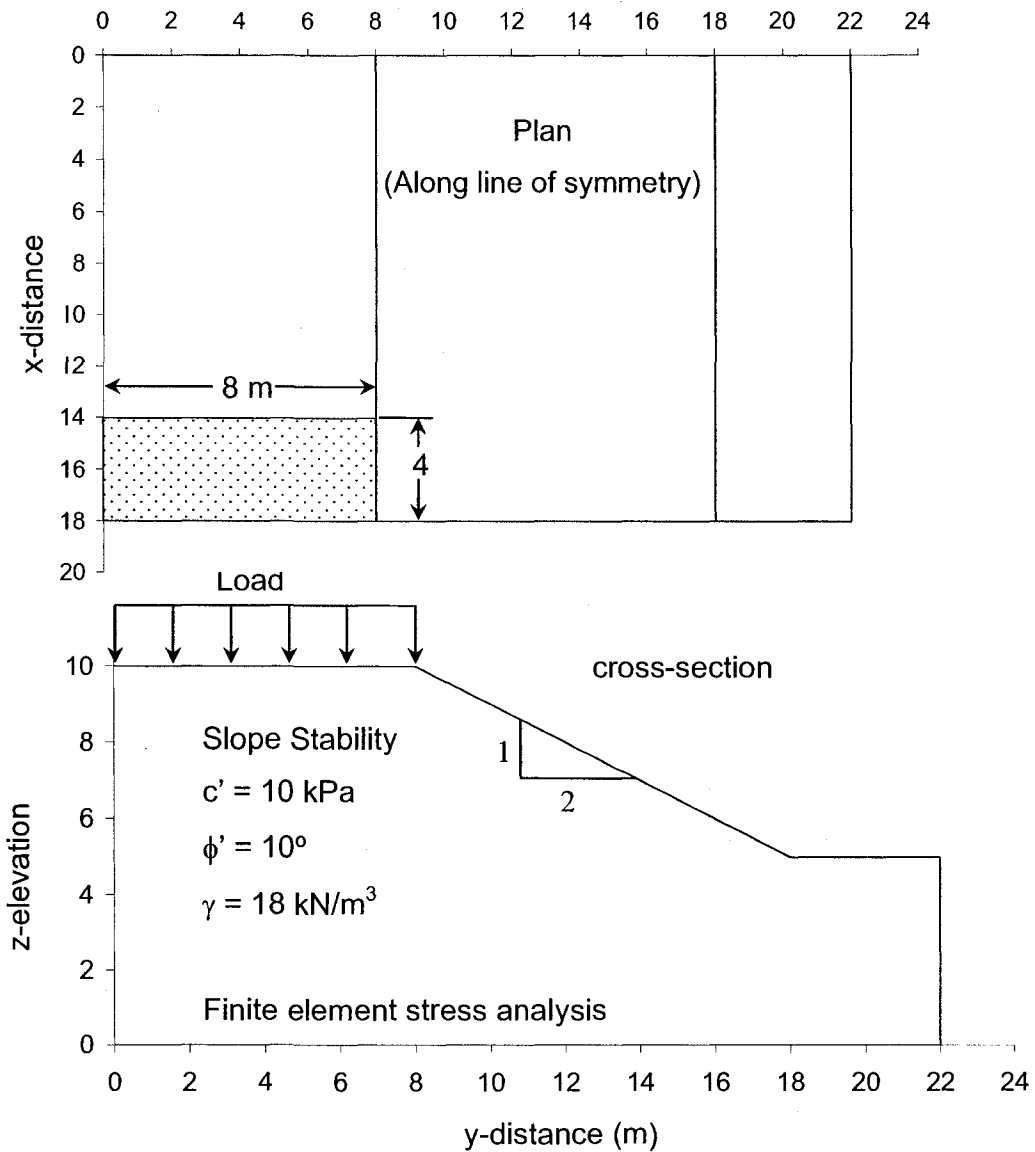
Plan view and cross-section view of the simple homogeneous slope considered in Example No. 1.
